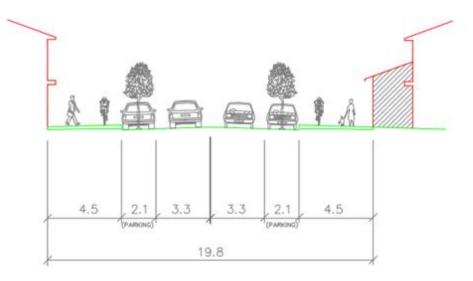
Rudloc Road: Russell Street to Coode Street
